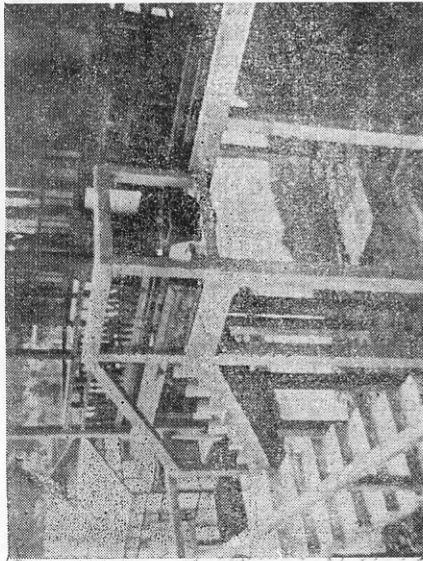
Building Constructed with Slender columns and without ties at footing or at any other level.
